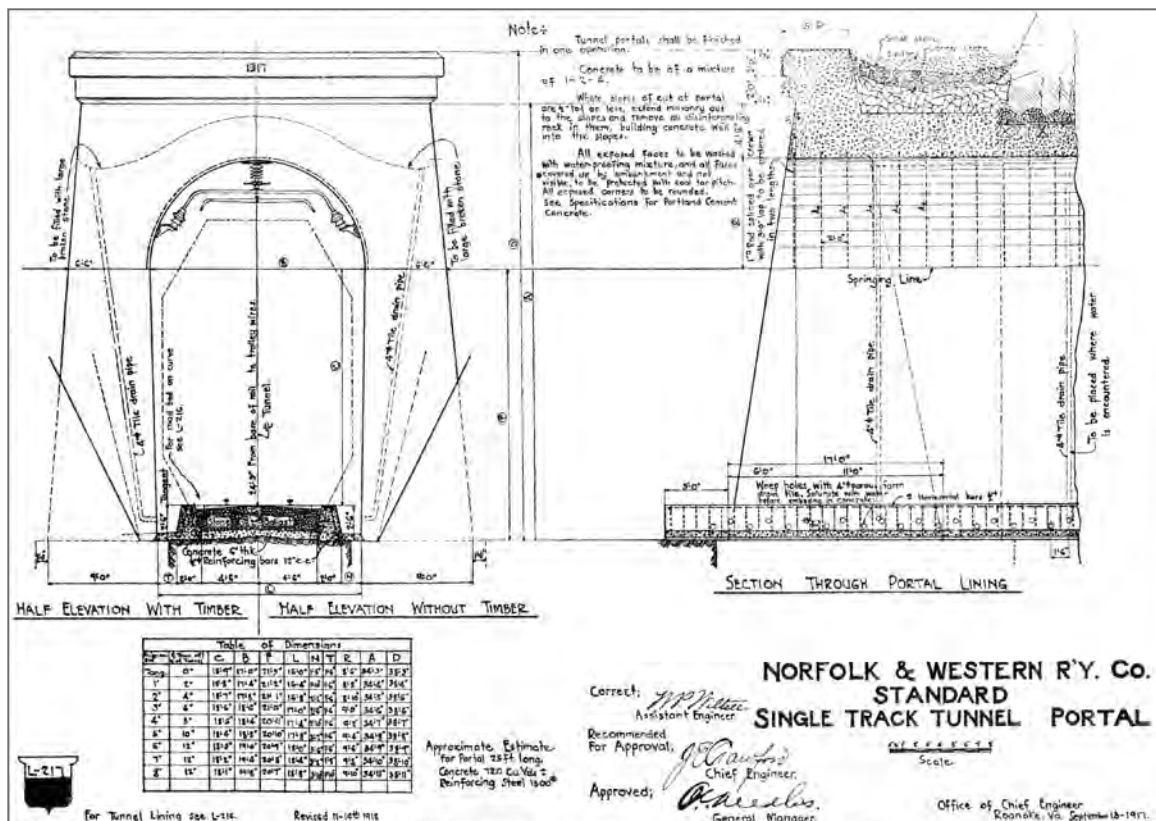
Standard Plan Designed by Norfolk and Western Engineers for Single-Track Tunnel, 1917.
